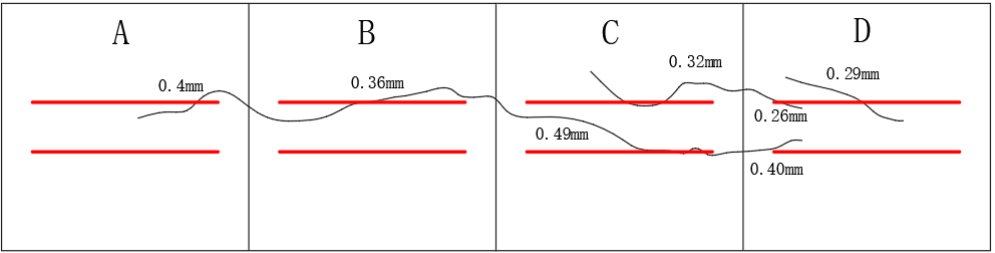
Cracking patterns of concrete cover of C20 specimens.
